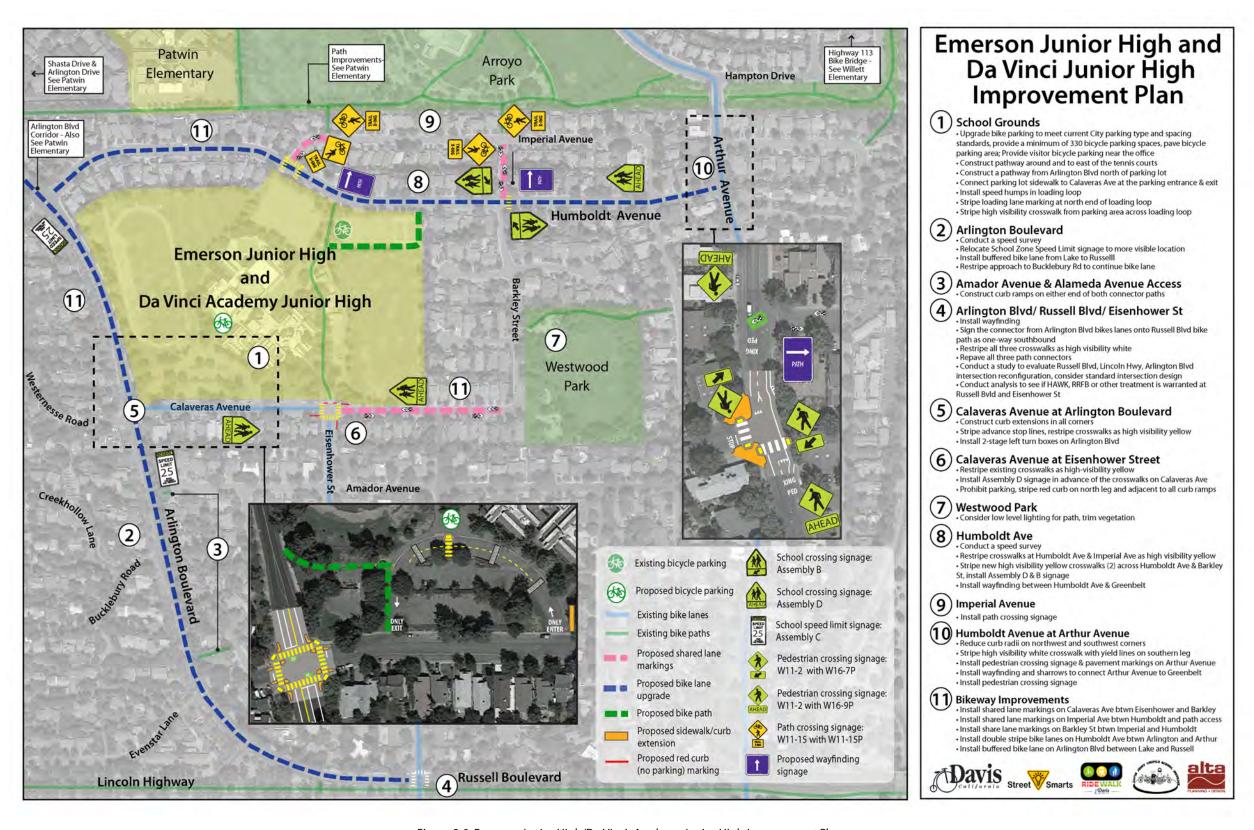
Emerson Junior High/Da Vinci Academy Junior High Improvement Plan
